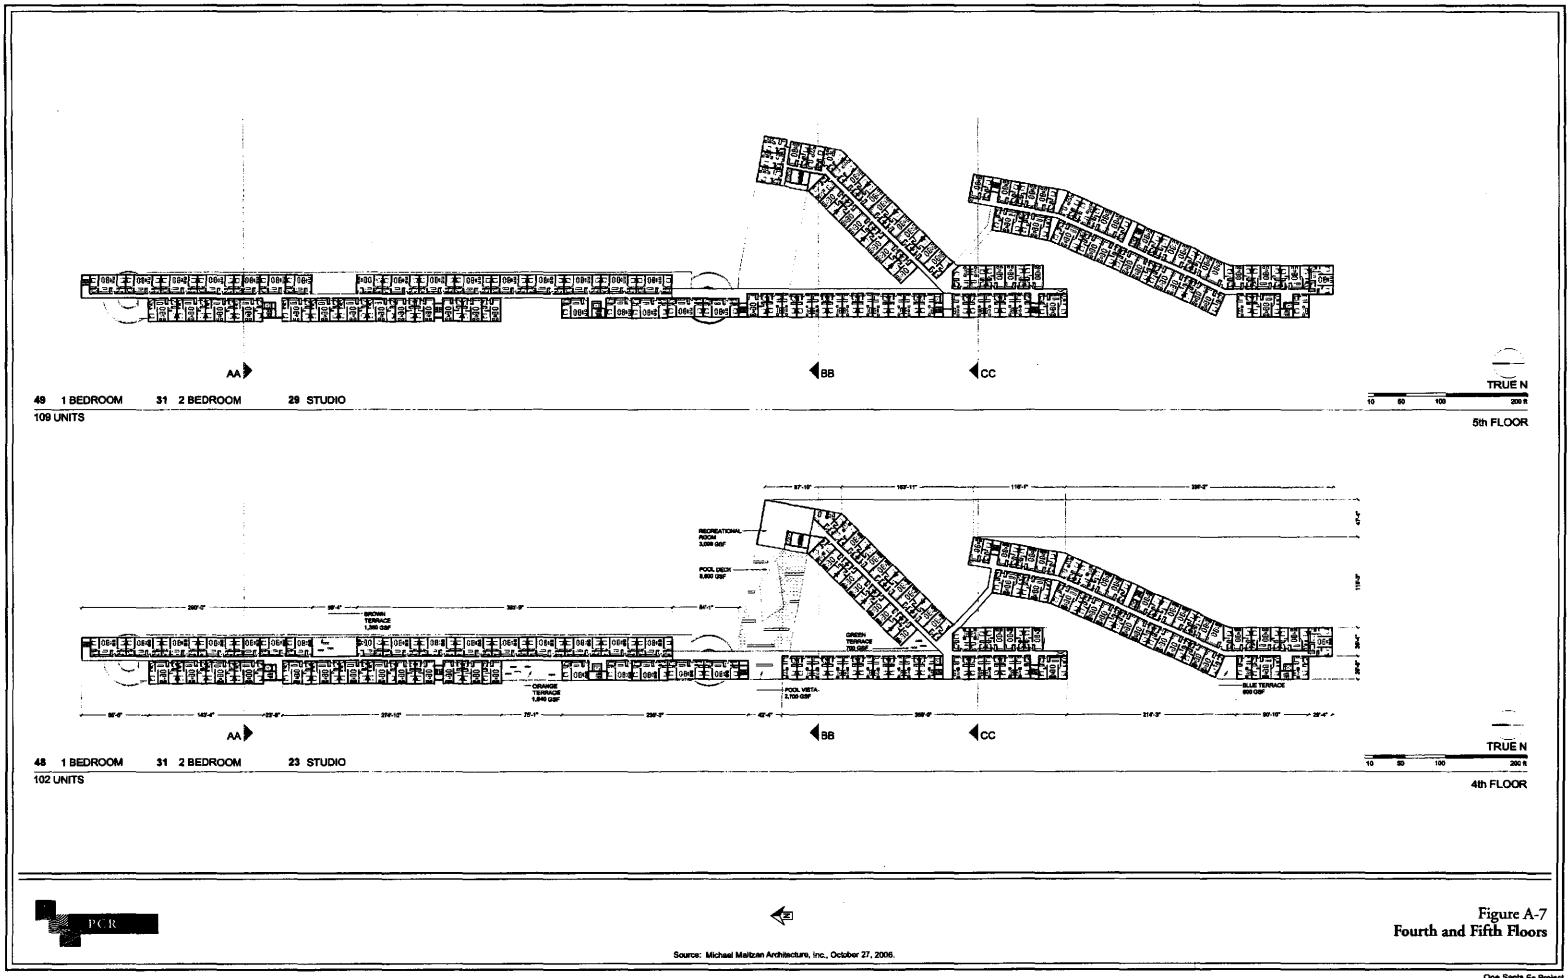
on page A-10 illustrates the second and third floor plans. As shown in Figure A-6, the second and third floors of the Building A parking podium contain approximately 121 and 122 parking stalls, respectively. Buildings B and C would consist entirely of apartment units on the second and third floors. Figure A-7 on page A-11 illustrates the fourth and fifth floor plans. Building D would be developed on the fourth through sixth floors and is essentially a residential "bridge" over the plaza area that connects Buildings A and B. As shown in Figure A-7, the fourth floor of Building B that is perpendicular to Santa Fe Avenue would include a pool and deck area. The remaining areas of the fourth and fifth floors of Buildings A, B, C and D would consist of apartment units. Figure A-8 on page A-12 illustrates the sixth floor plan. Similar to the fourth and fifth floors, the sixth floor would consist of apartment units. Overall, the Project proposes approximately 439 apartment units consisting of approximately 96 studios, 219 one-bedroom, 111 two-bedroom and 13 loft units.
